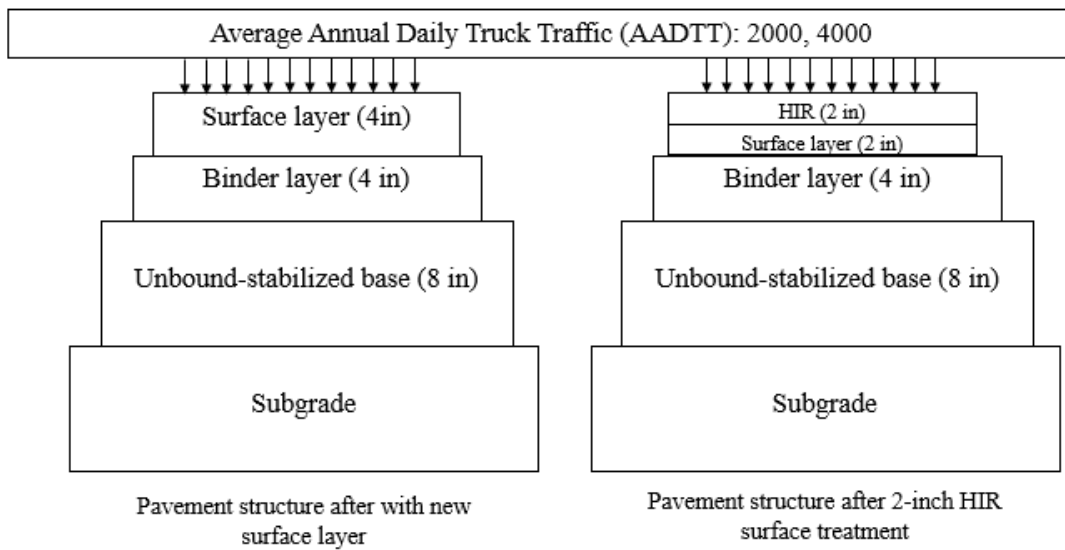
Pavement structure models of two pavements; (a) New HMA surface layer; (b) after HIR surface treatment.
